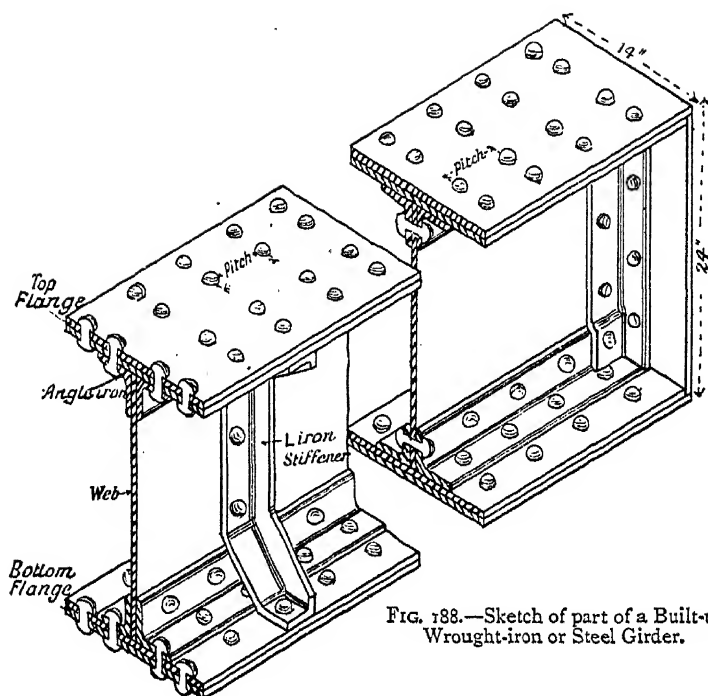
Sketch of part of a Built-up Wrought-iron or Steel Girder.
